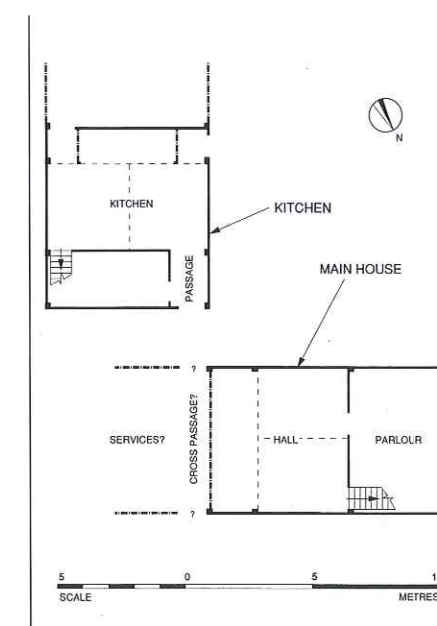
Plan of the early to mid-16th century house and kitchen at Darwell Beech (Mountfield, Sussex). Note the passage that, as at Comphurst (Fig 3), leads towards the house.
